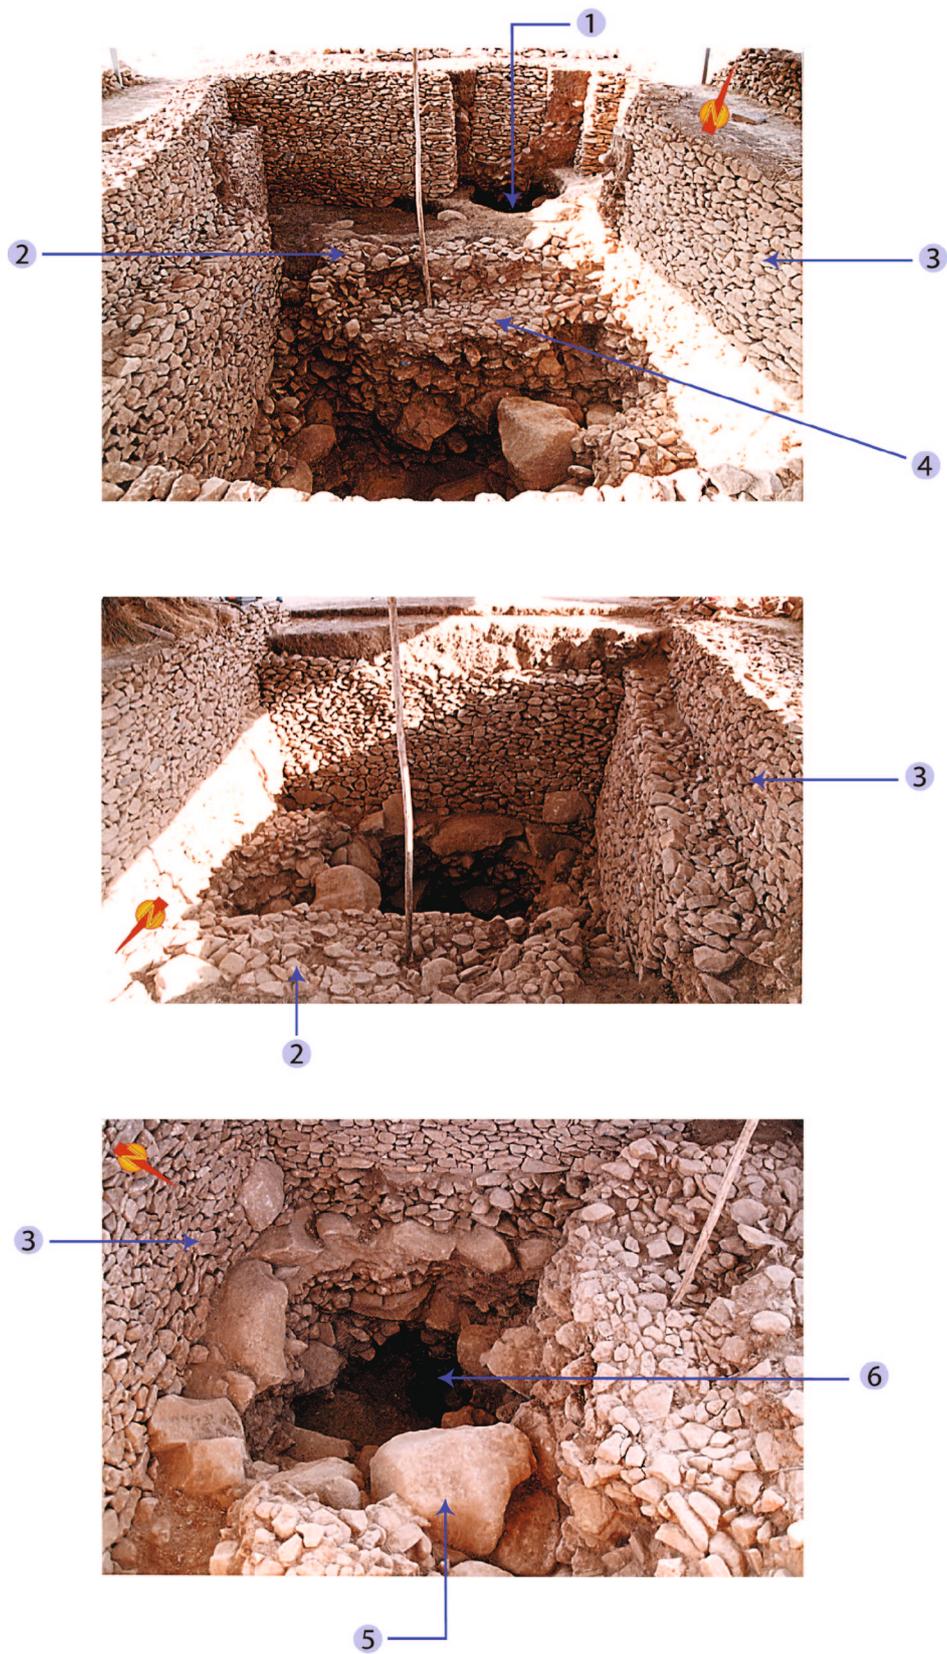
Aksum, 1999: general view of the excavation at the foot of Stela 2. 1: Pit F10; 2: surface of the masonry of the foundation of Stela 2; 3: contemporary support wall; 4: location (in negative) of the “footing slab”; 5: rock; 6: window created through the foundation building to the resistant substrate (photograph: B. Poissonnier, CFEE).
